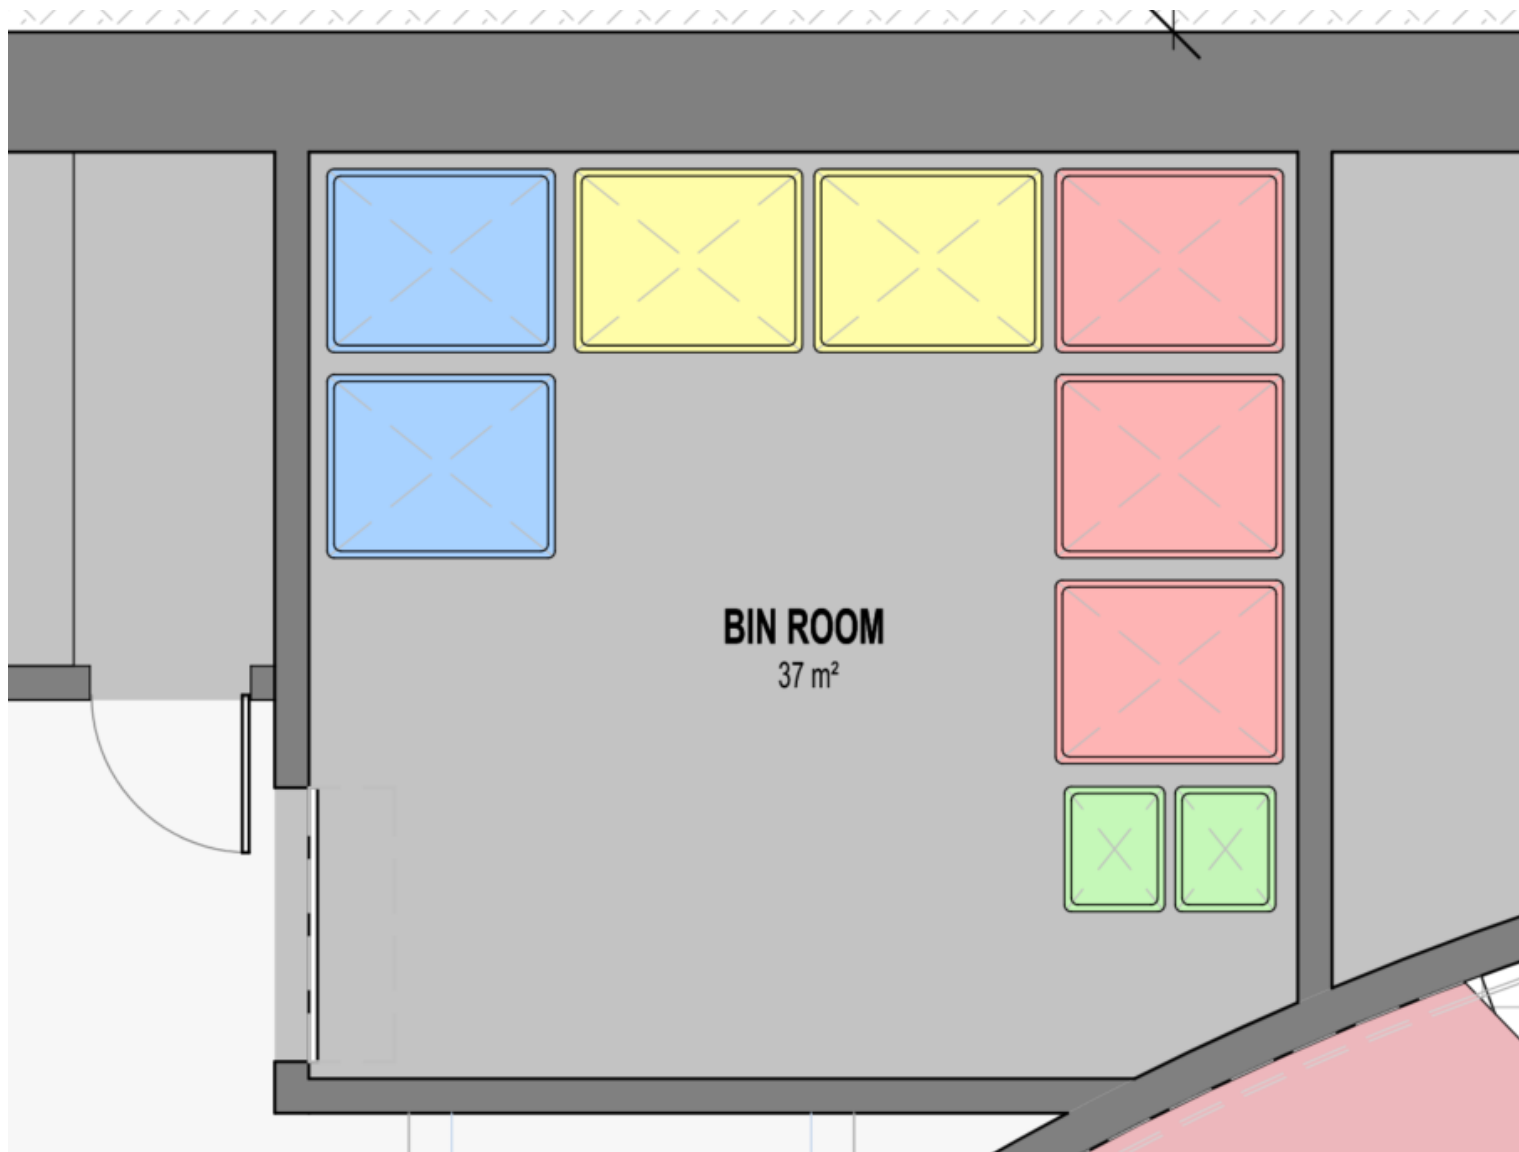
Bin Room Layout - Building D (ELC & Theatre)
